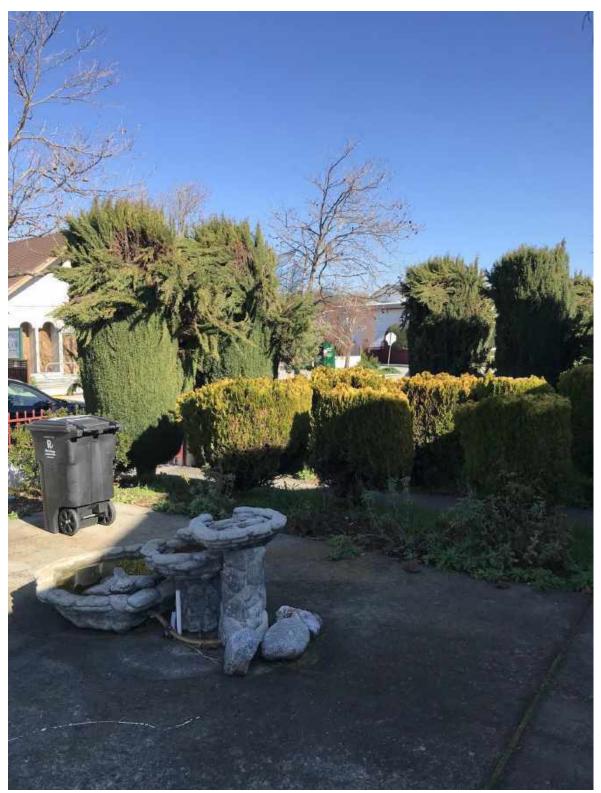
Site of new foundation for ADU, encompassing tree #13 (left) and three (3) small arborvitae.
